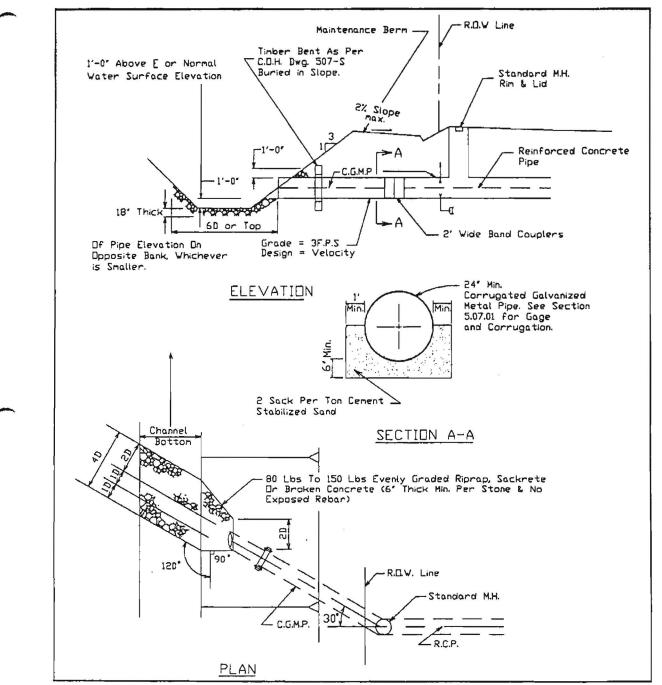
Typical Storm Sewer Outfall Structure (42-inch and larger)
